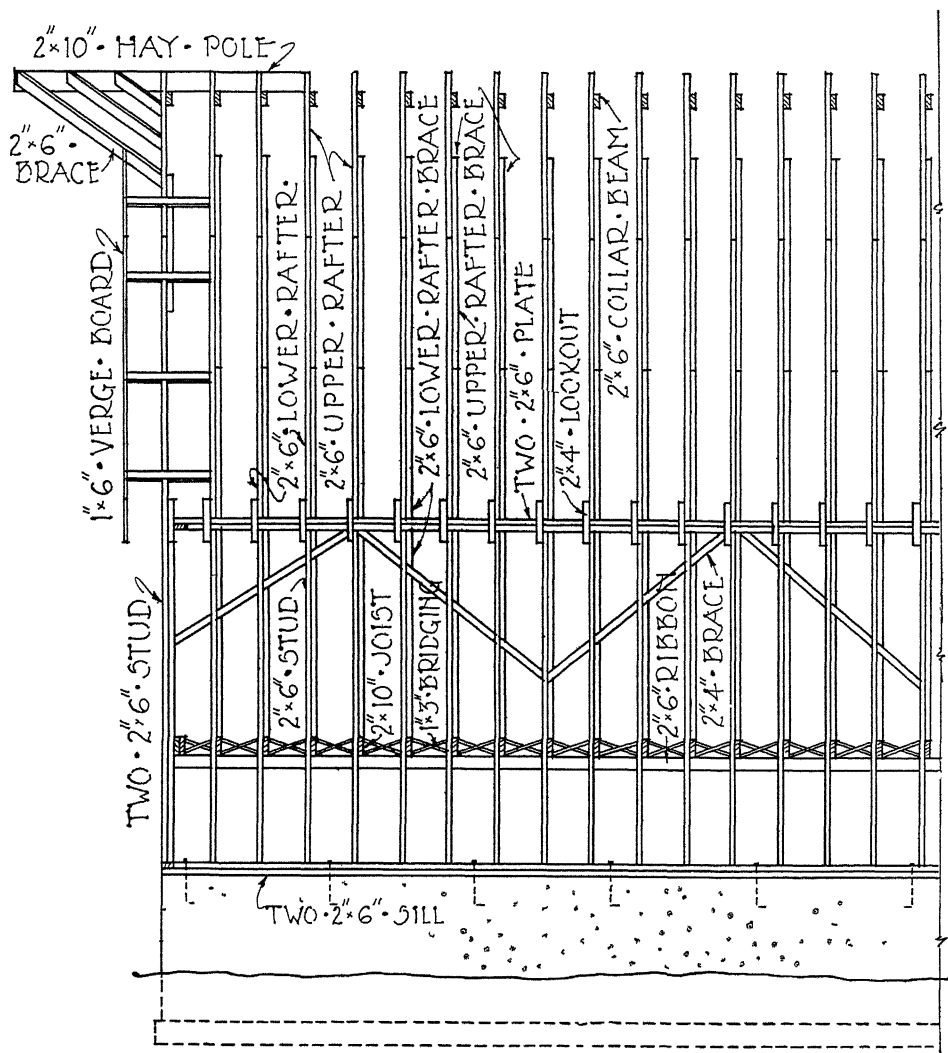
Side framing Door openings not shown. These will vary according to floor plans.
